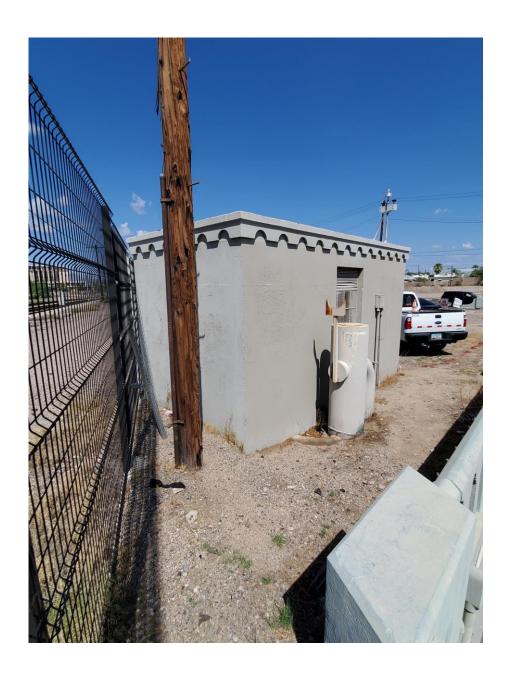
East elevation of pump house, Parcel Number 117-05-068F
